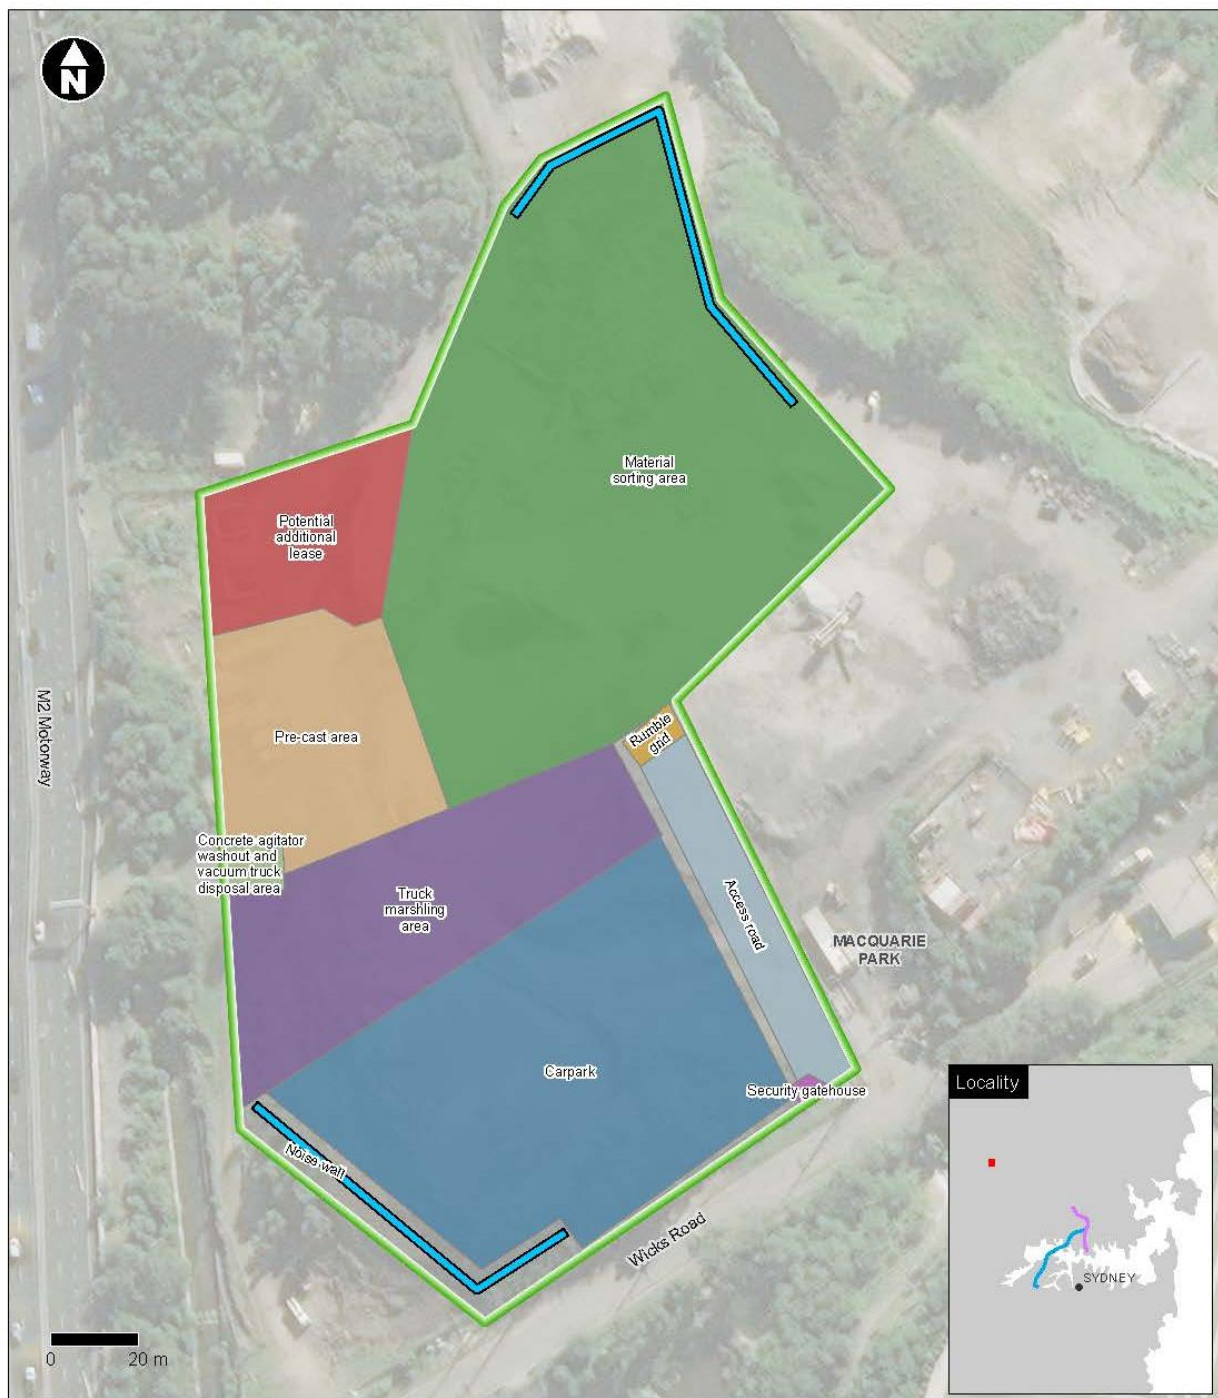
Indicative layout of the proposed Wicks Road construction support site (WFU10) as presented in the modification report
